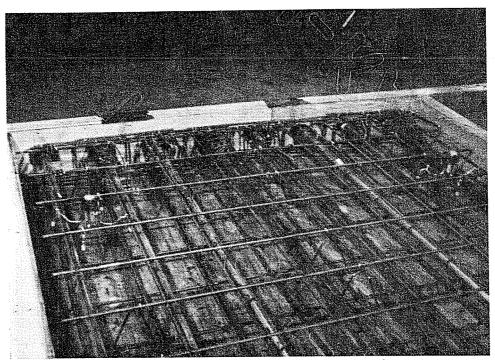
Pre-Formed Crack in Slab #2 (Anchorage Zones A, C, H)
